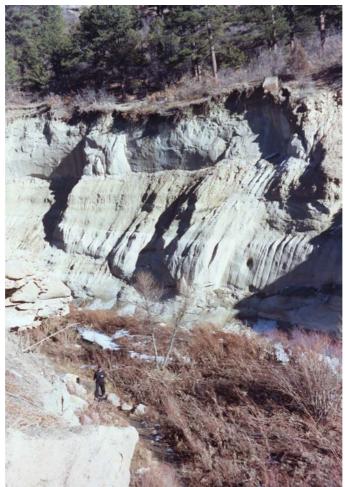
Right abutment slopes downstream of dam, showing excessive erosion in Dawson Arkose during and following failure. Note near vertical slopes in sandstone and less steep slopes in center mudstone
